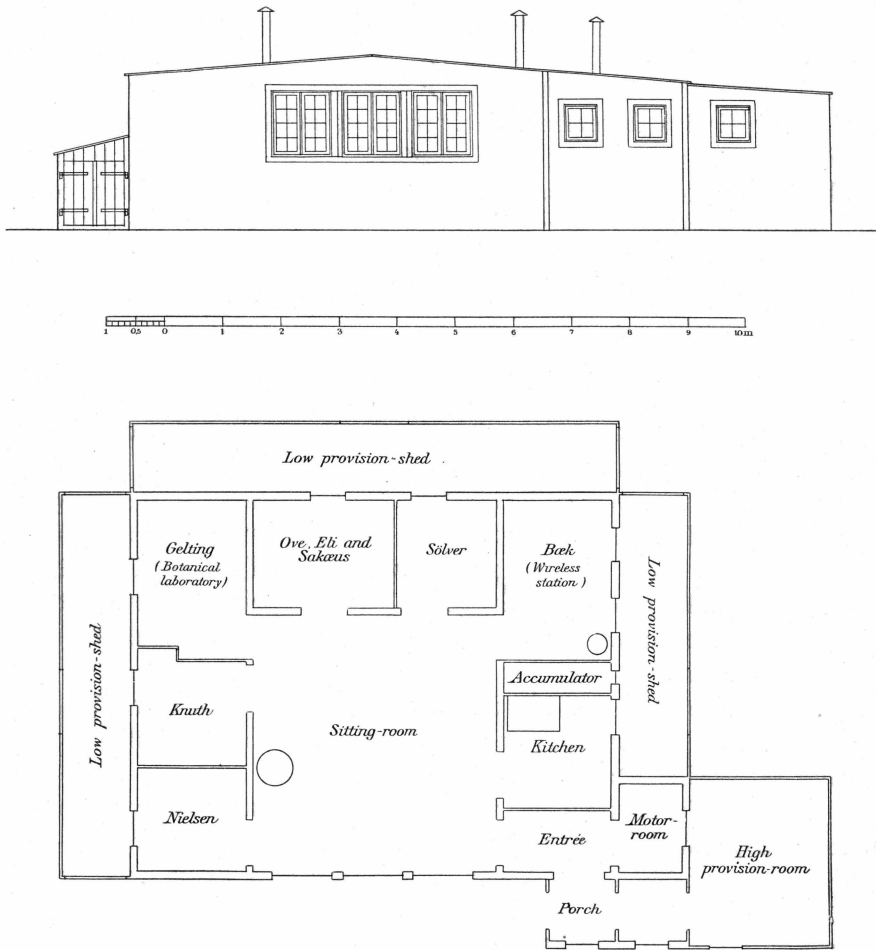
Plan and elevation of the station house "Mørkefjord".
